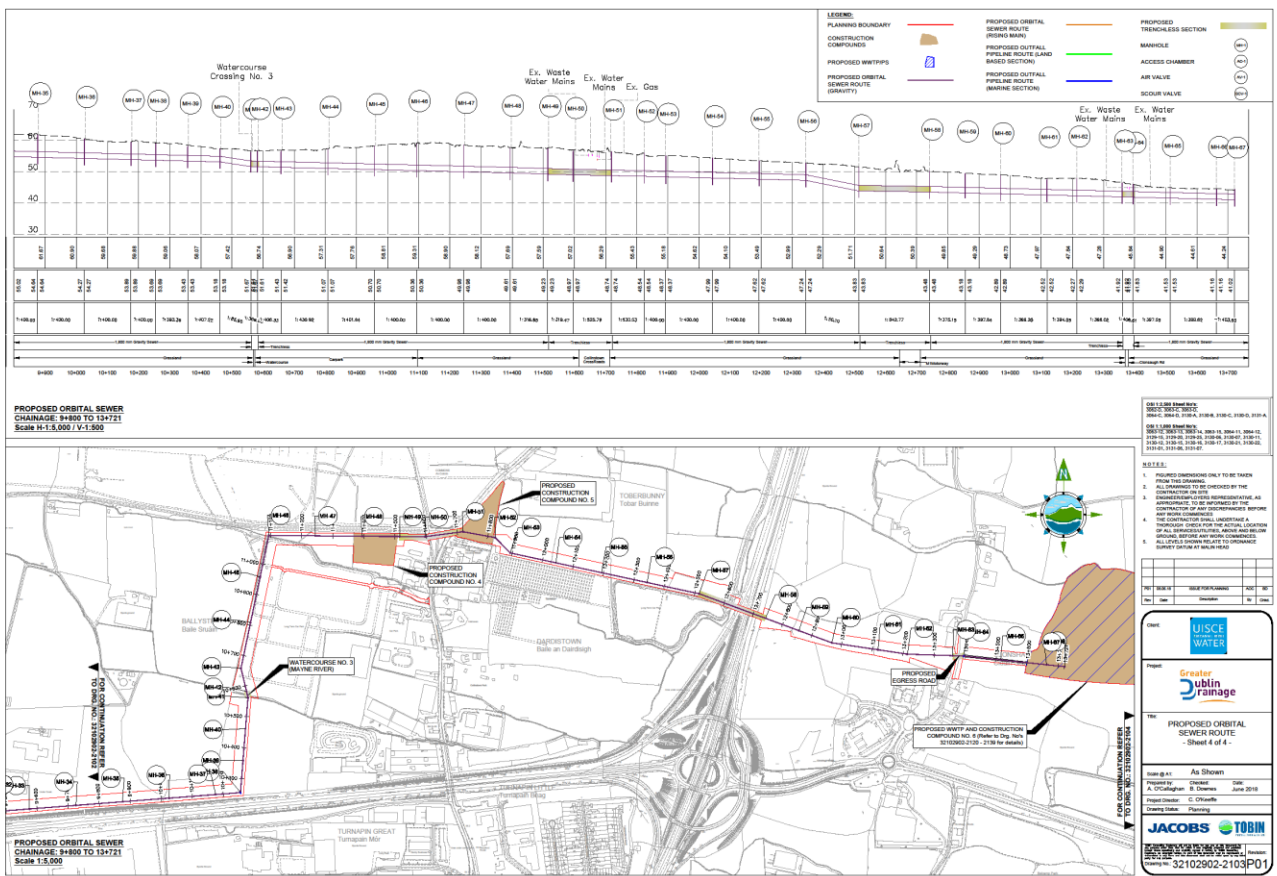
Greater Dublin Drainage (GDD) Project Plan at Dardistown
